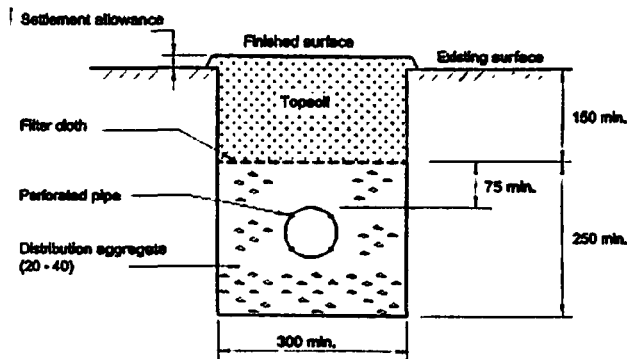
Conventional Piped Trench Construction Details (AS/NZS1547:2000)
